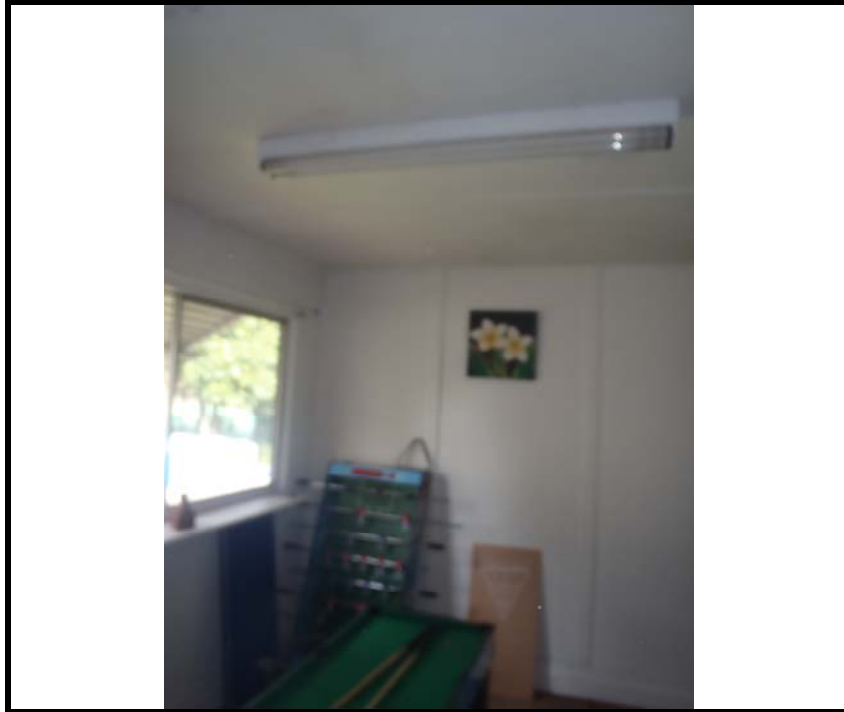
ACM sheeting used in the walls and ceiling to the games room; fluorescent light that potentially contains PCB also shown (at 1 McLeod Road)
